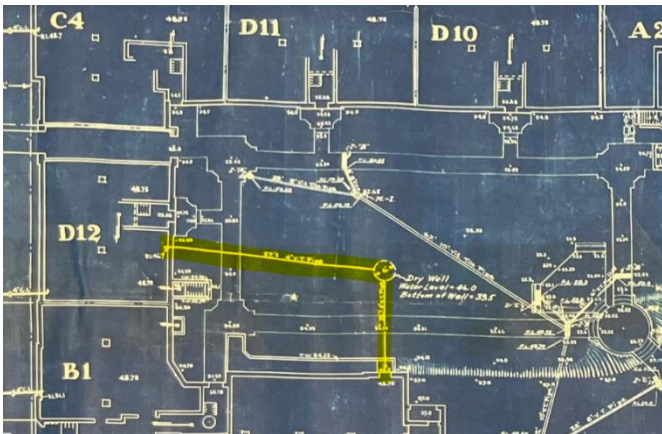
Record drawing with highlighted stormwater connections of the dry-well in northwest
